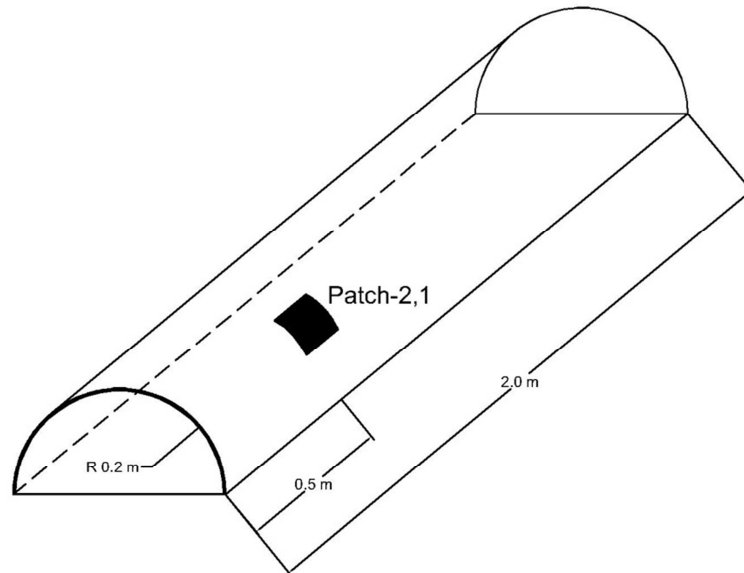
Schematic model for Semi-cylindrical single wall subject to Patch Load
